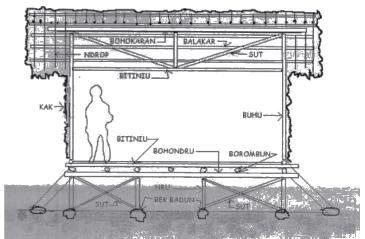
Section of Main Living Room with details in vernacular terms – House Two (Bakok)
